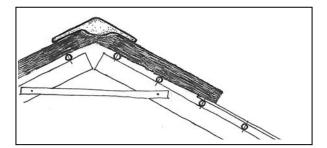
Detail of typical hybrid roof with thatch and metal sheeting
